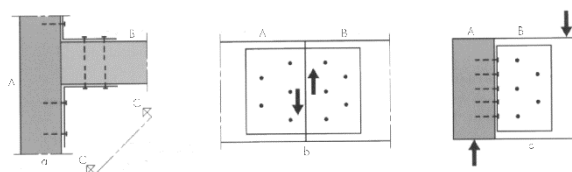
Beam to beam connection. Connection with two angle brackets and nails or screws.
